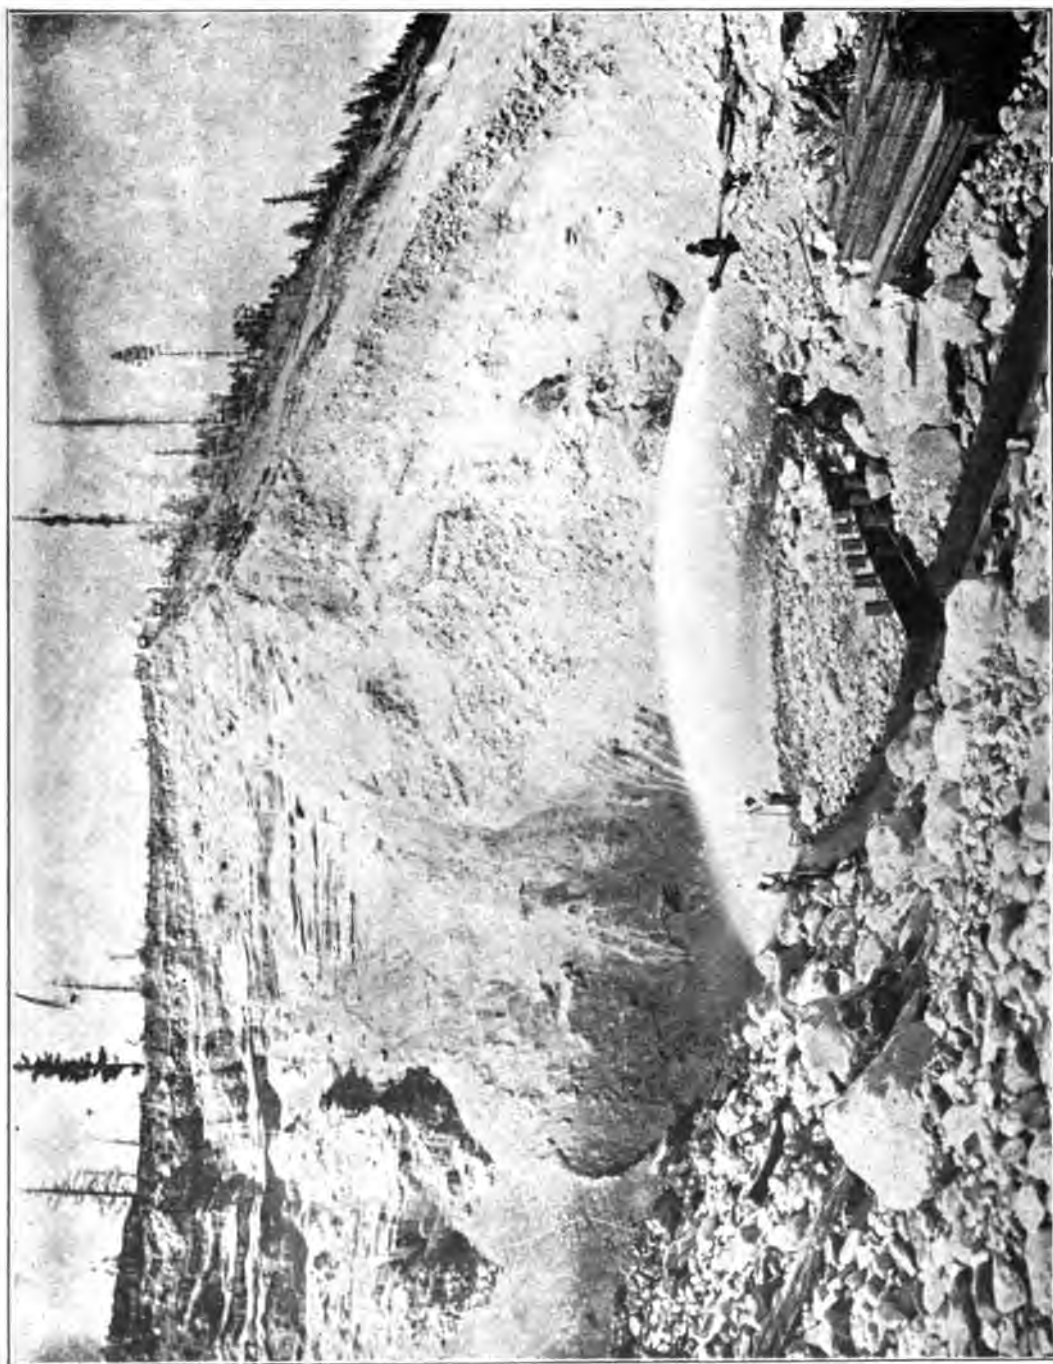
HYDRAULIC SLUICING, CANADIAN PACIFIC RAILWAY. VIEW OF PIT, AND HYDRAULIC GIANT AT WORK
